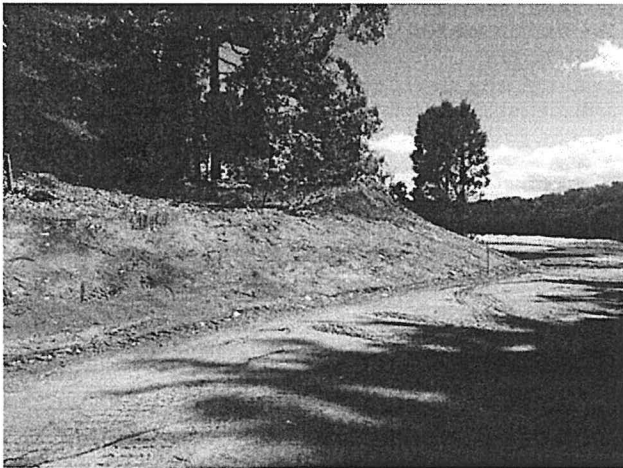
Facing south – showing southwest side of 3 Brown Avenue
